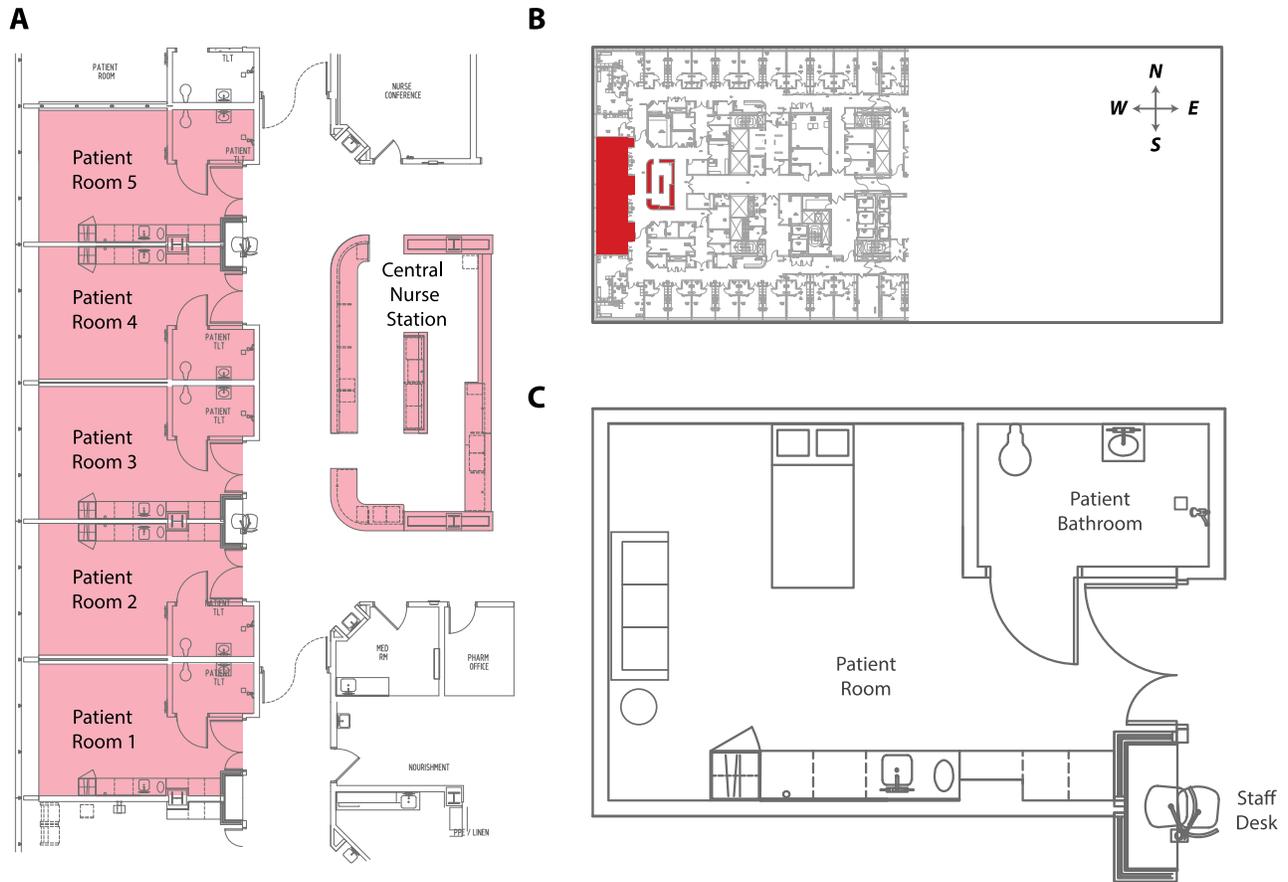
Floor plan of sampling locations. Floor plan for the 9th and 10th floors of the Center for Care and Discovery, University of Chicago. The floor plan is identical for the 9th and 10th floor, where all sampling for the study occurred. (A) Location of the 5 rooms sampled on the floor in the study in relation to the central nurse station, which was also sampled. (B) Location of the sampled rooms and nurse station within the hospital building, with geographic orientation. (C) Floor plan of an individual patient room.
